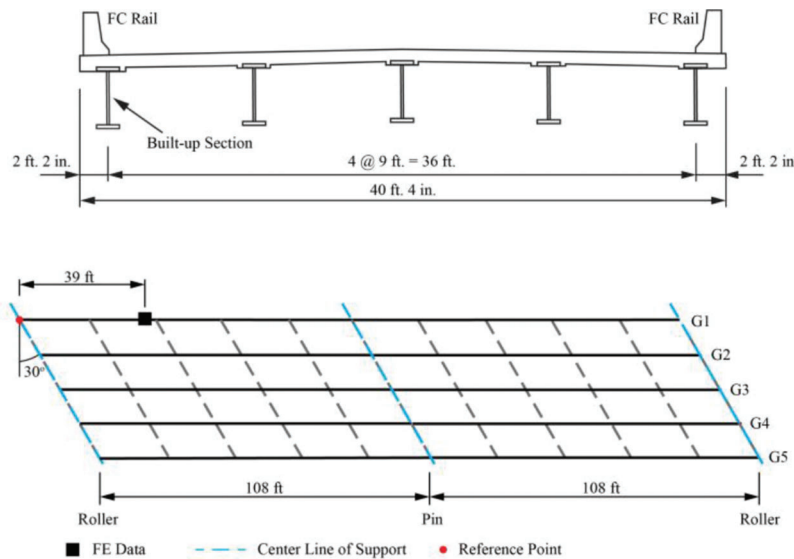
Cross-section and frame plan of the modified two-span continuous steel girder bridge with 30-degree skew angle.
